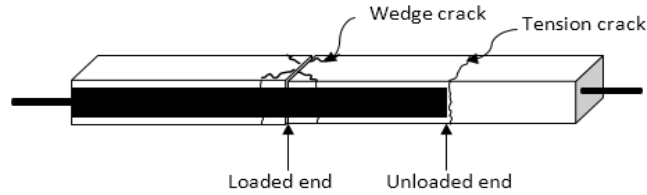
Close-up View of the Crack Patterns after Specimen Failure
